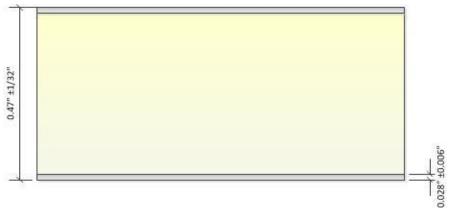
1/2-INCH GOBOARD® THICKNESS DIMENSIONS
